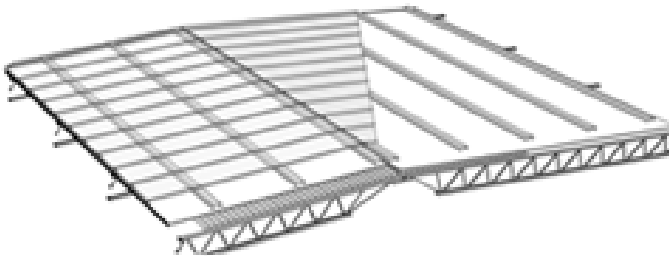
M: Metal-over-sloped conventional roof system (existing bar joist system shown) (Courtesy Metal Sales Manufacturing)
